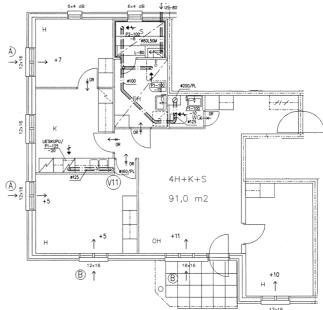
Floor plan 1 with the type of apartments A, B and C
